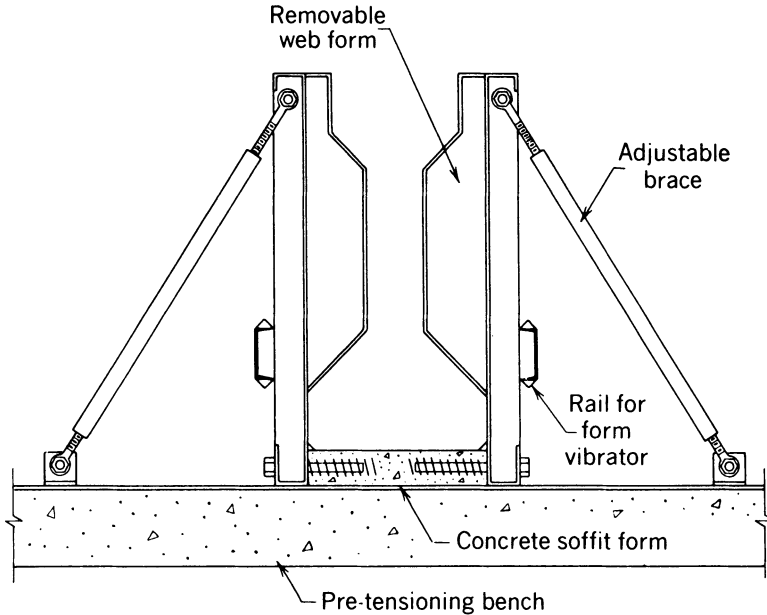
Cross section of an adjustable steel form suitable for the manufacture of pretensioned concrete beams.
